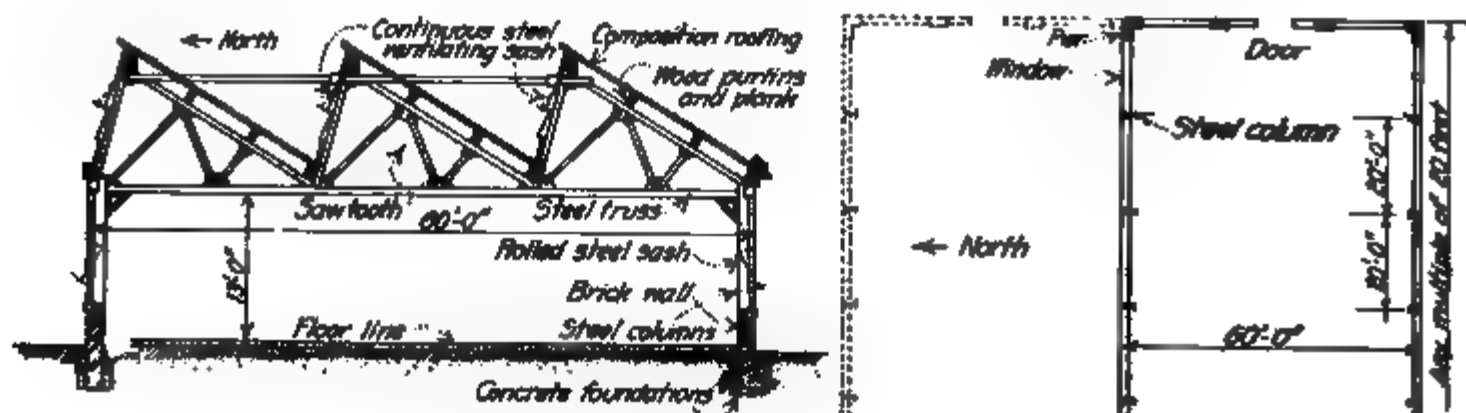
"Bessemer 70" building of the Crowell-Lundoff-Little Co.
